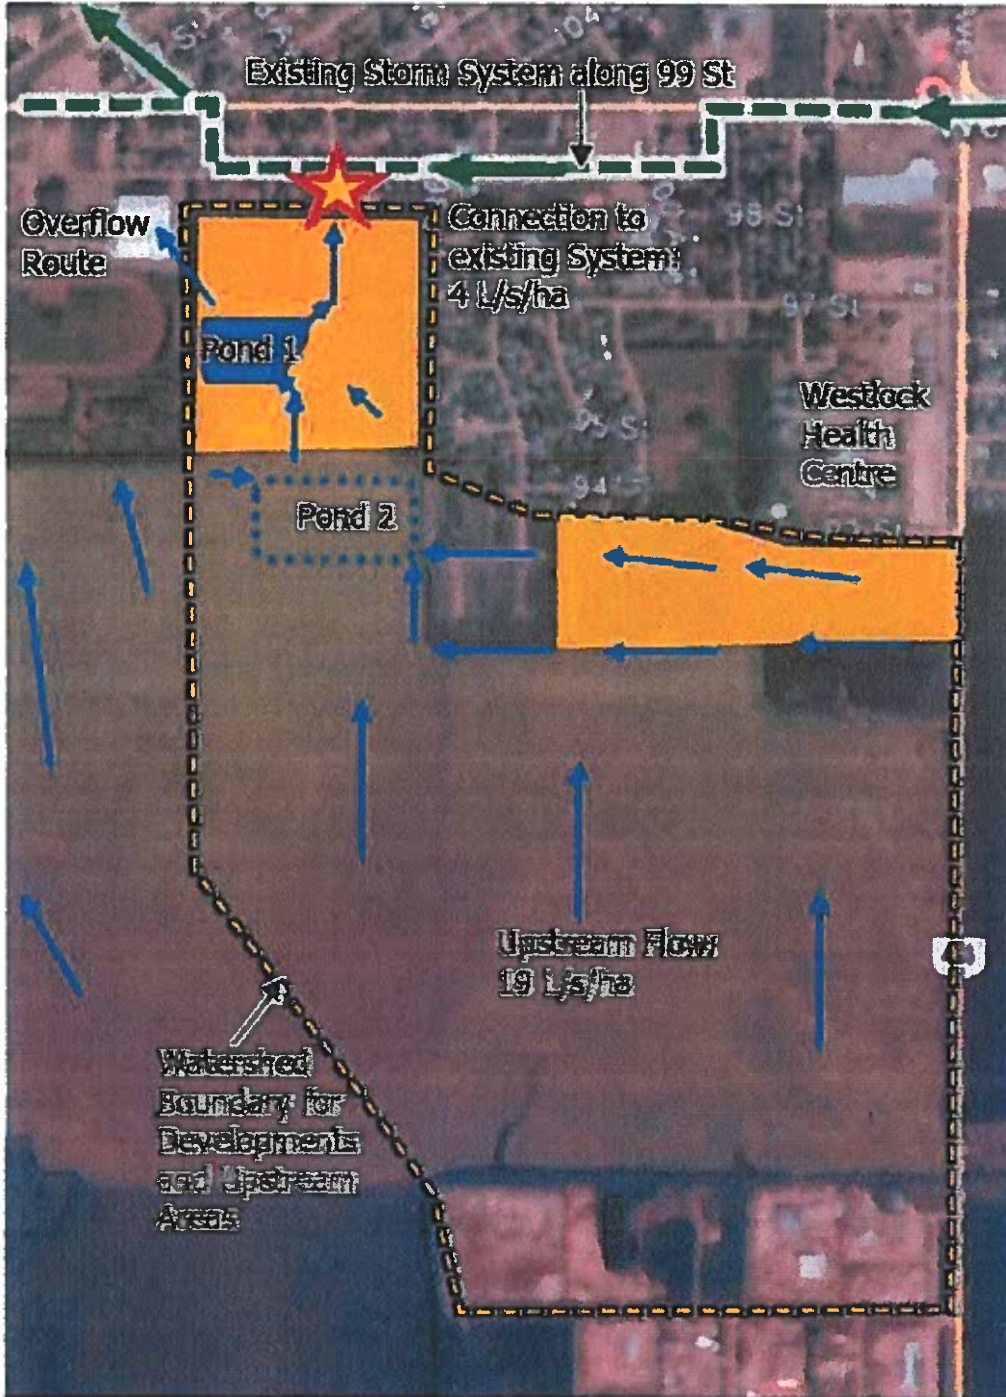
PROPOSED STORMWATER MANAGEMENT SYSTEM
